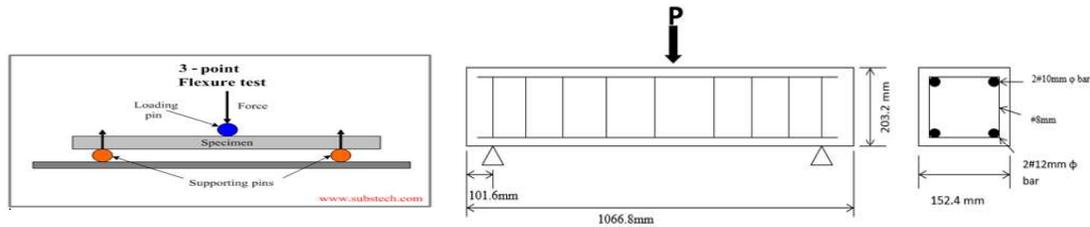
Schematic view of beam dimension in longitudinal and cross section and three points loading
